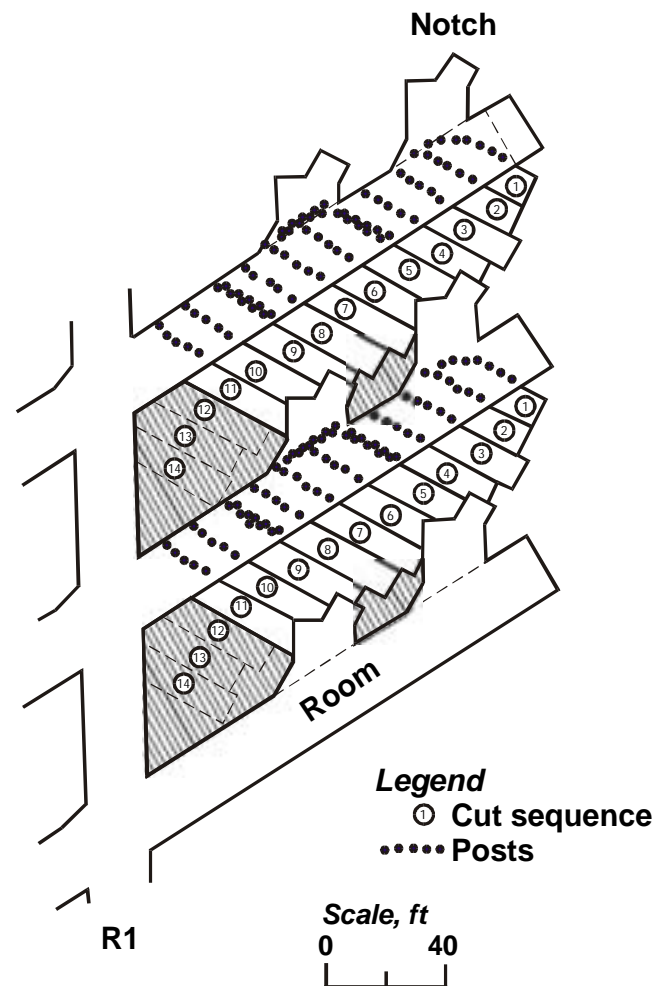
Pillaring plan in E19 that was changed because of floor heave
